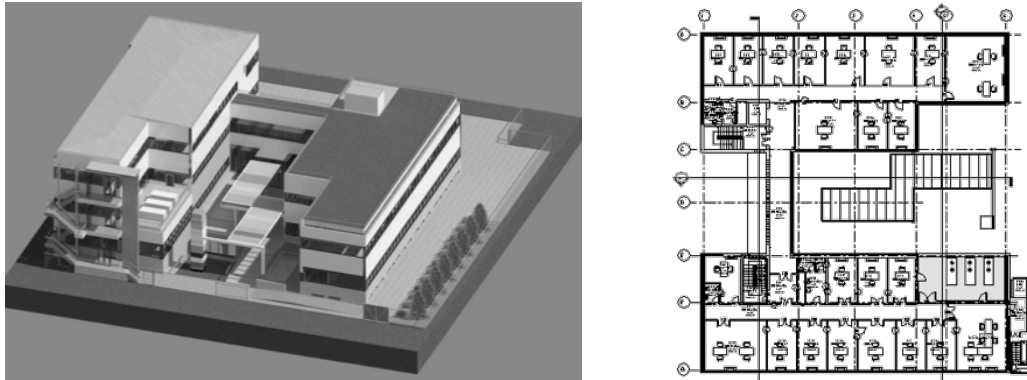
BIM model of the case study (left) and plan of the first floor (right)
